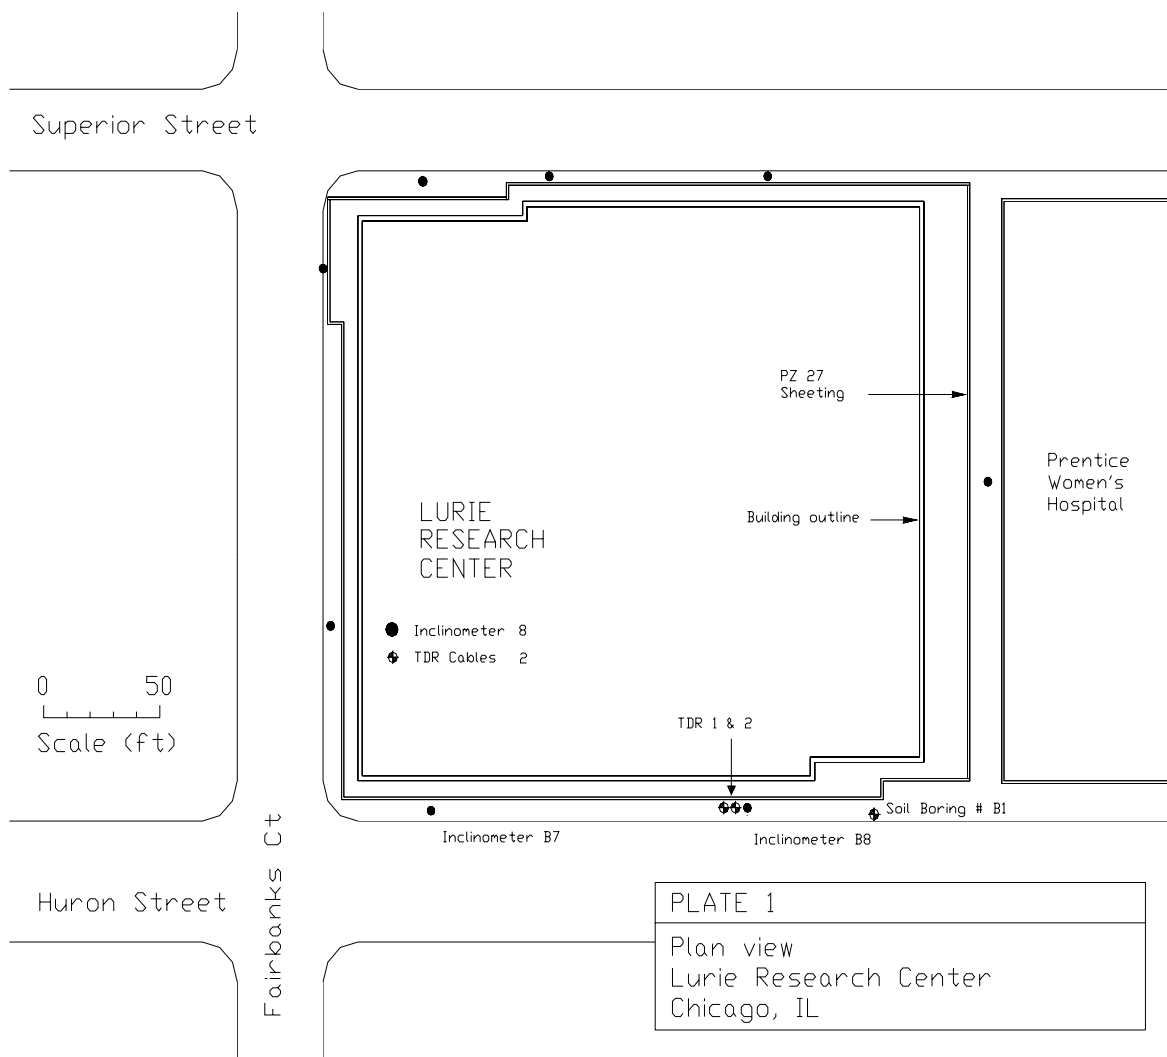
Plan view of the Lurie Research Center's excavation, Chicago, Illinois.
